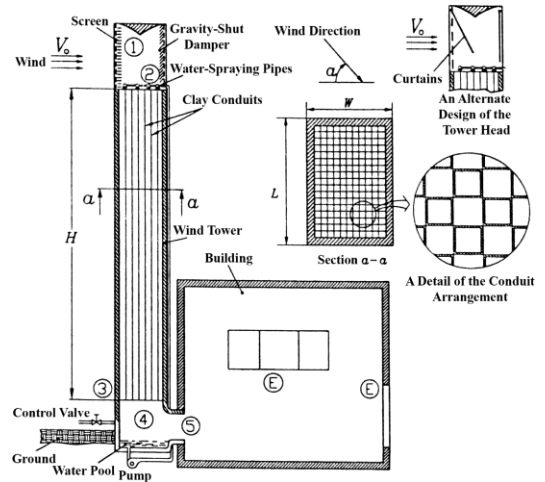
Section of a wind tower with wetted columns (M. N. Bahadori, Dehghani-Sanij, & Sayigh, 2016)
